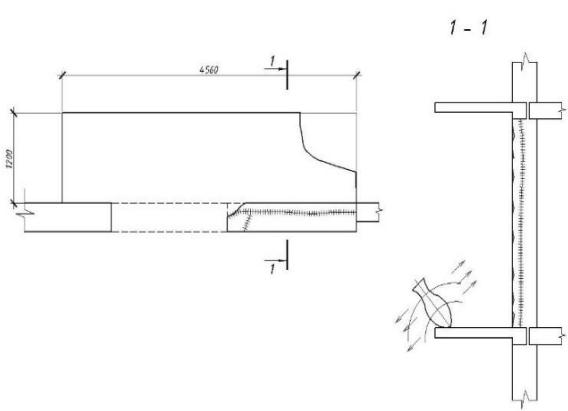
Diagram of structural damage due to a mortar shell hitting a balcony slab
